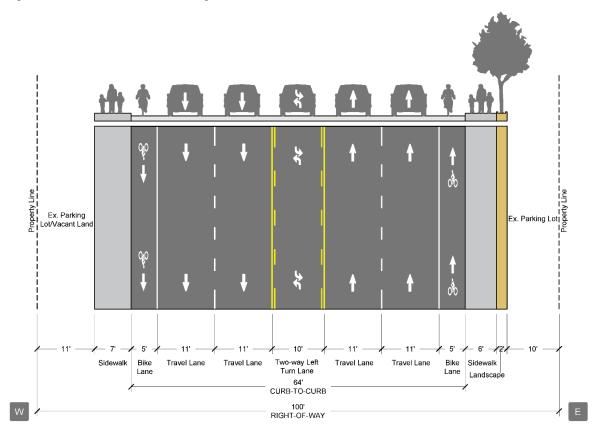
Cross-Section: Fruitridge Road to Jansen Drive
